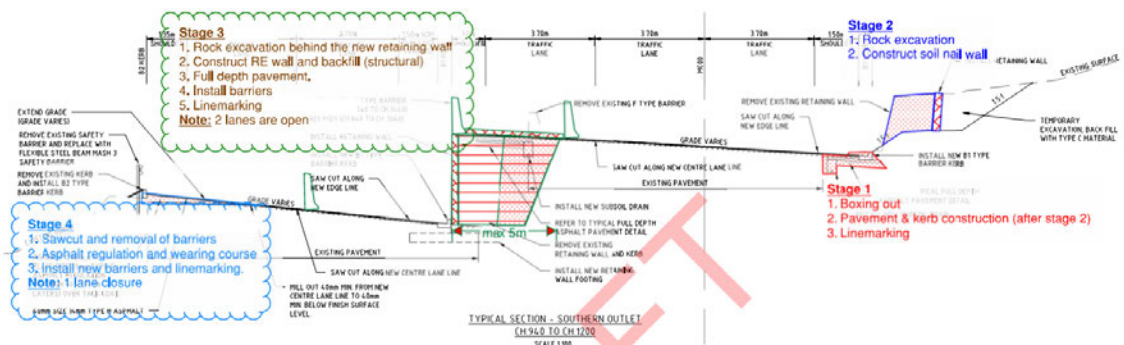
Typical section – Southern Outlet Ch. 940 to Ch. 1200
